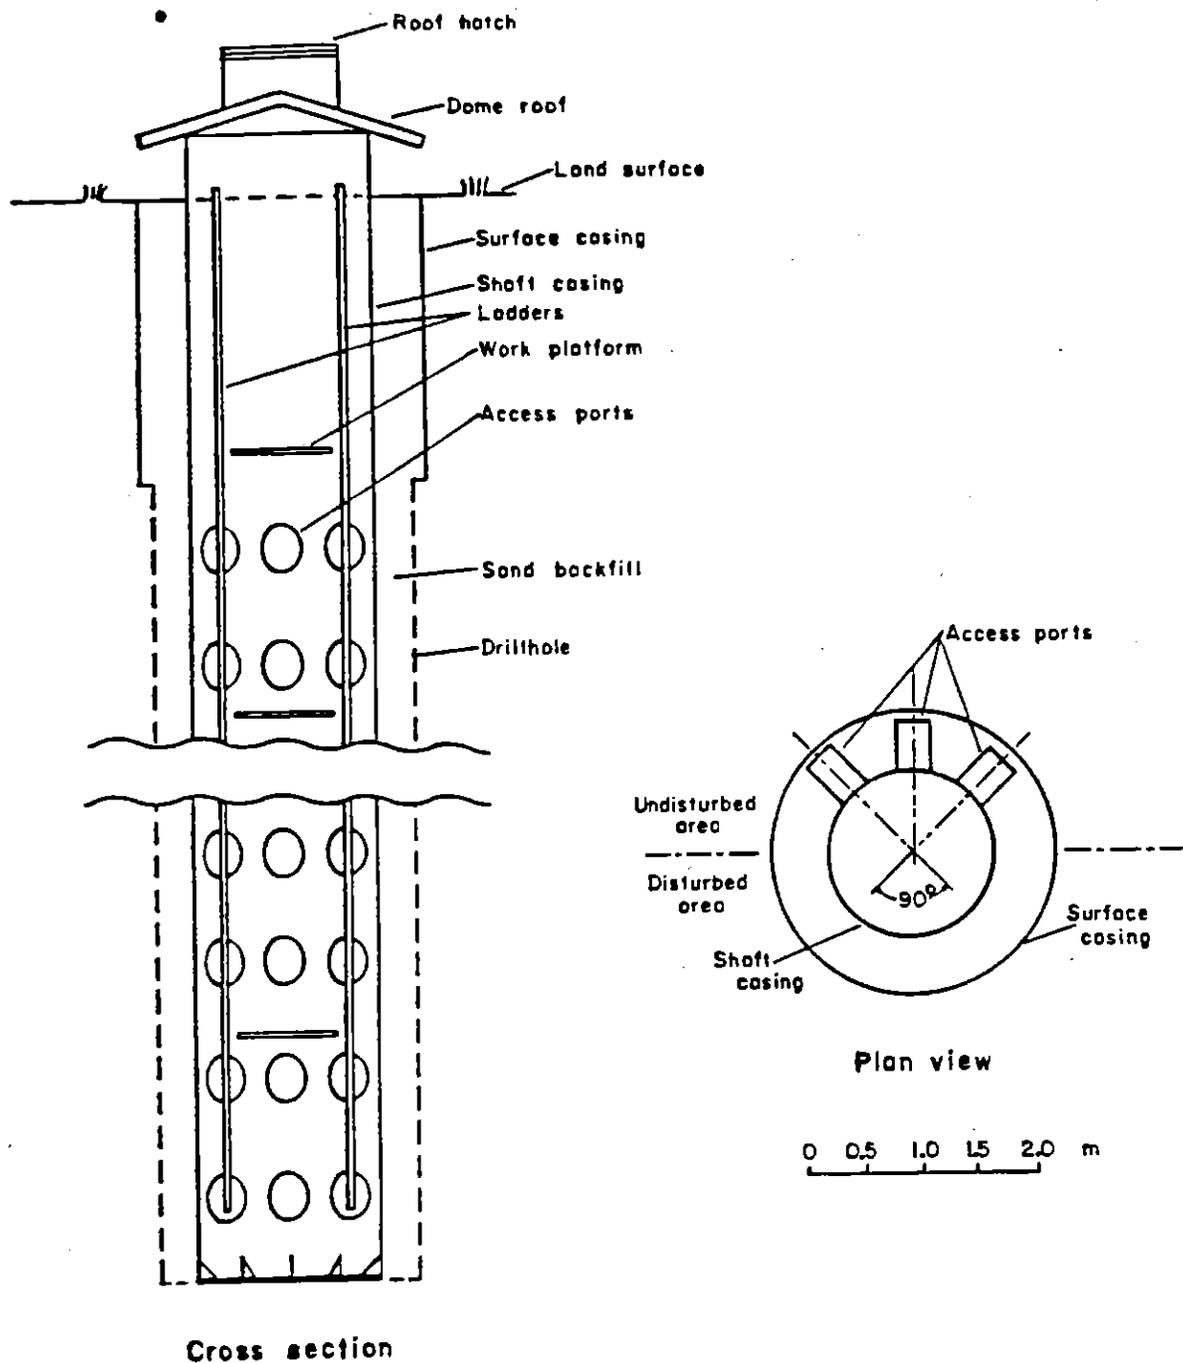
Cross-sectional and plan views of the vertical monitoring shaft.
